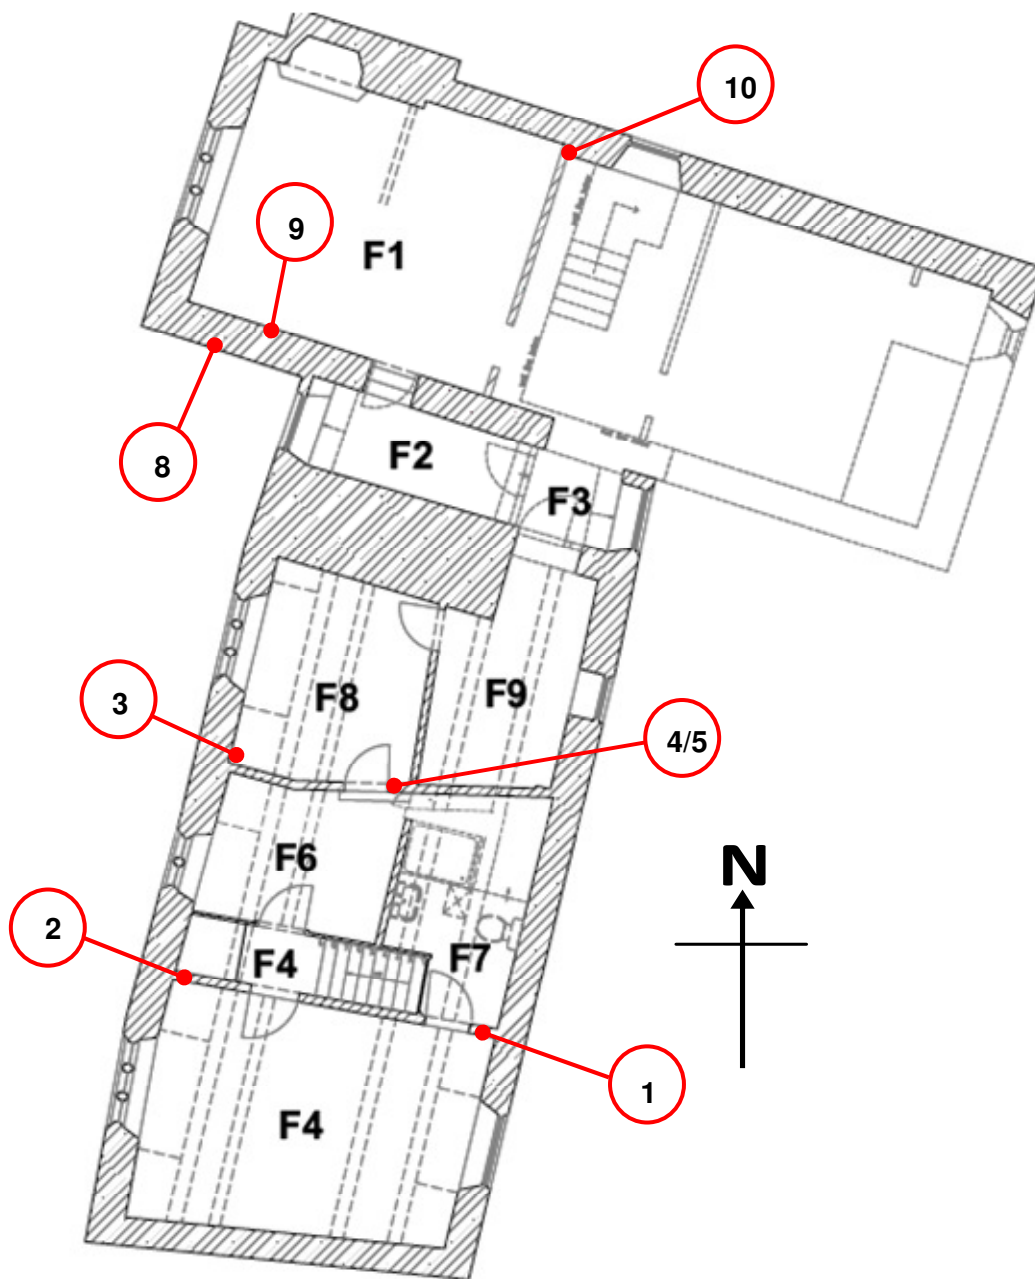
First floor plan to show approximate positions of the sampled timbers (after Iain Soden, Northamptonshire Archaeology)
